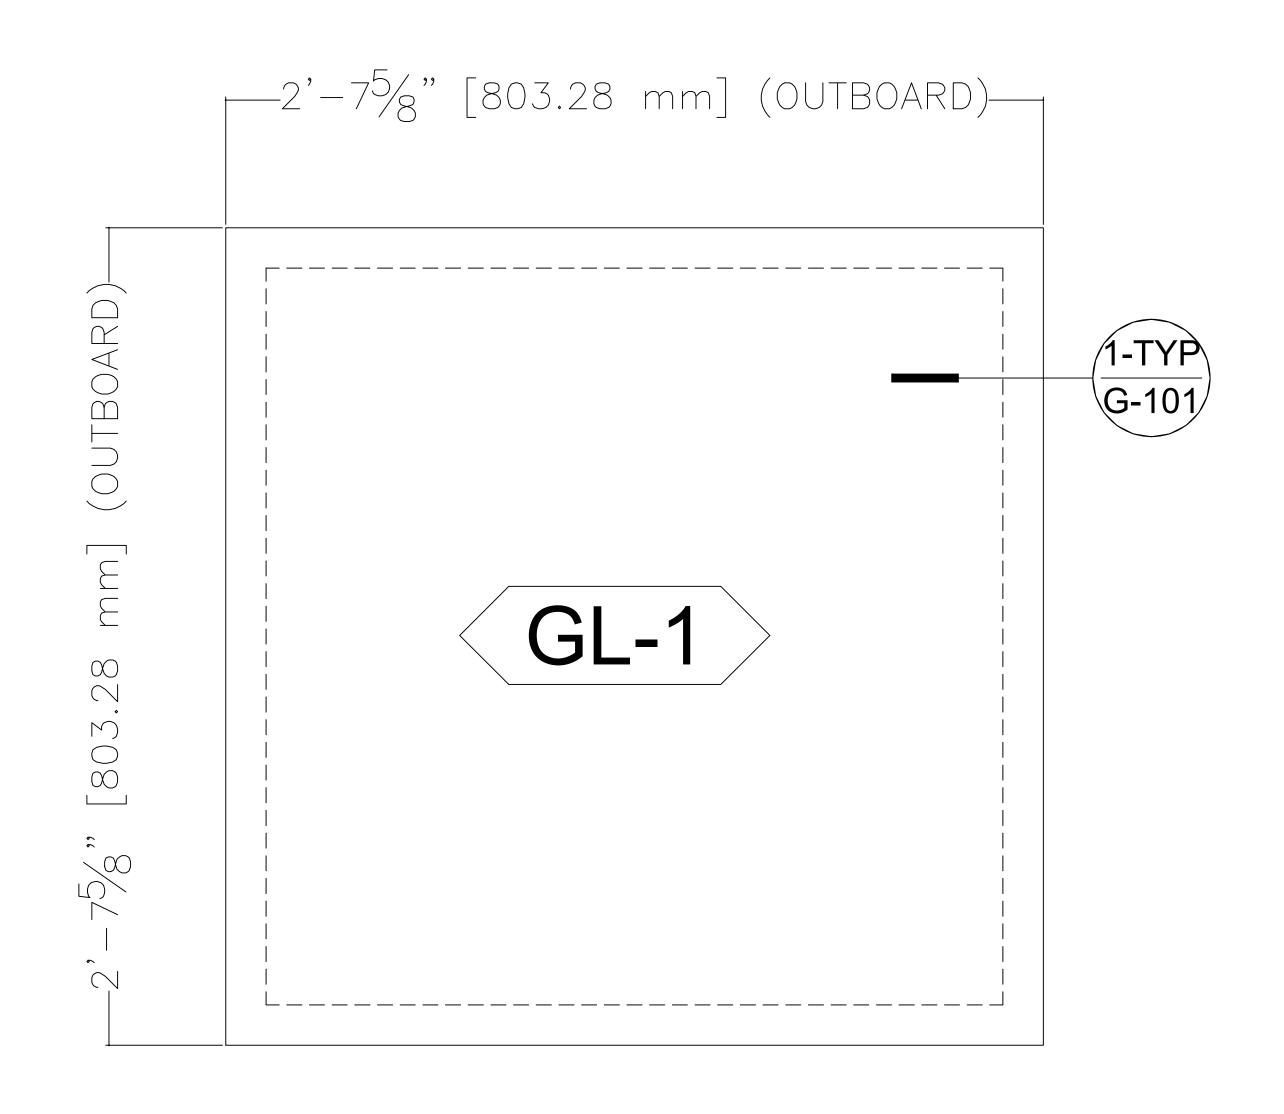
SKYFLOOR® MODULAR GLASS DECK
